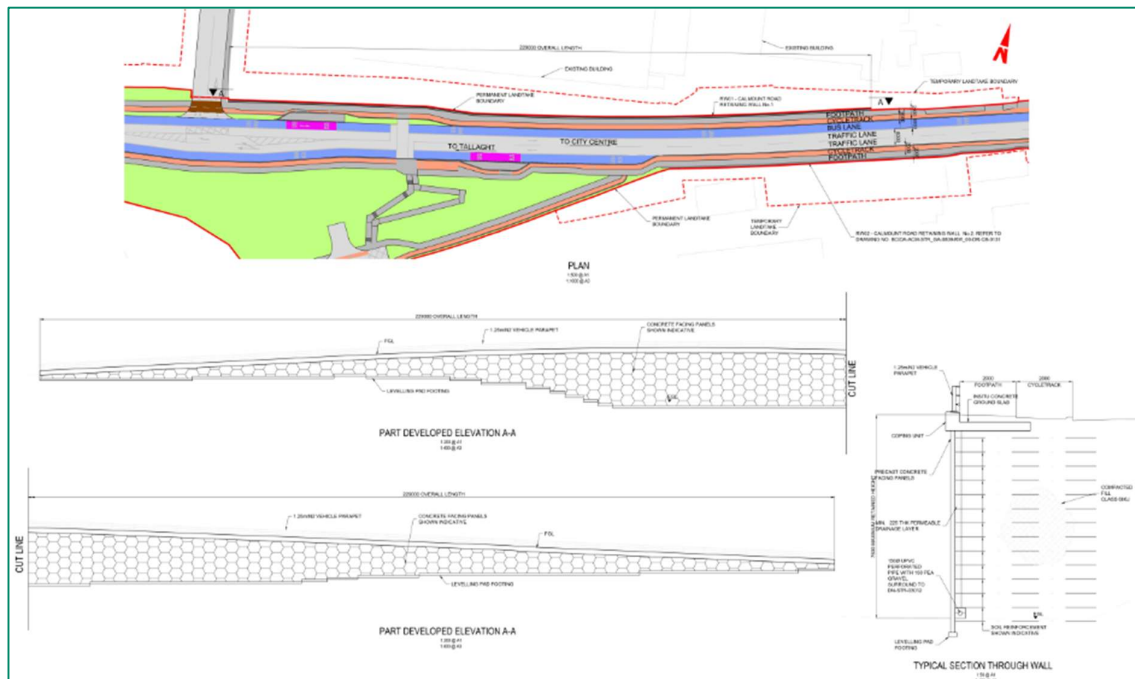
Extract of Major Retaining Structures Drawings showing details of RW01
